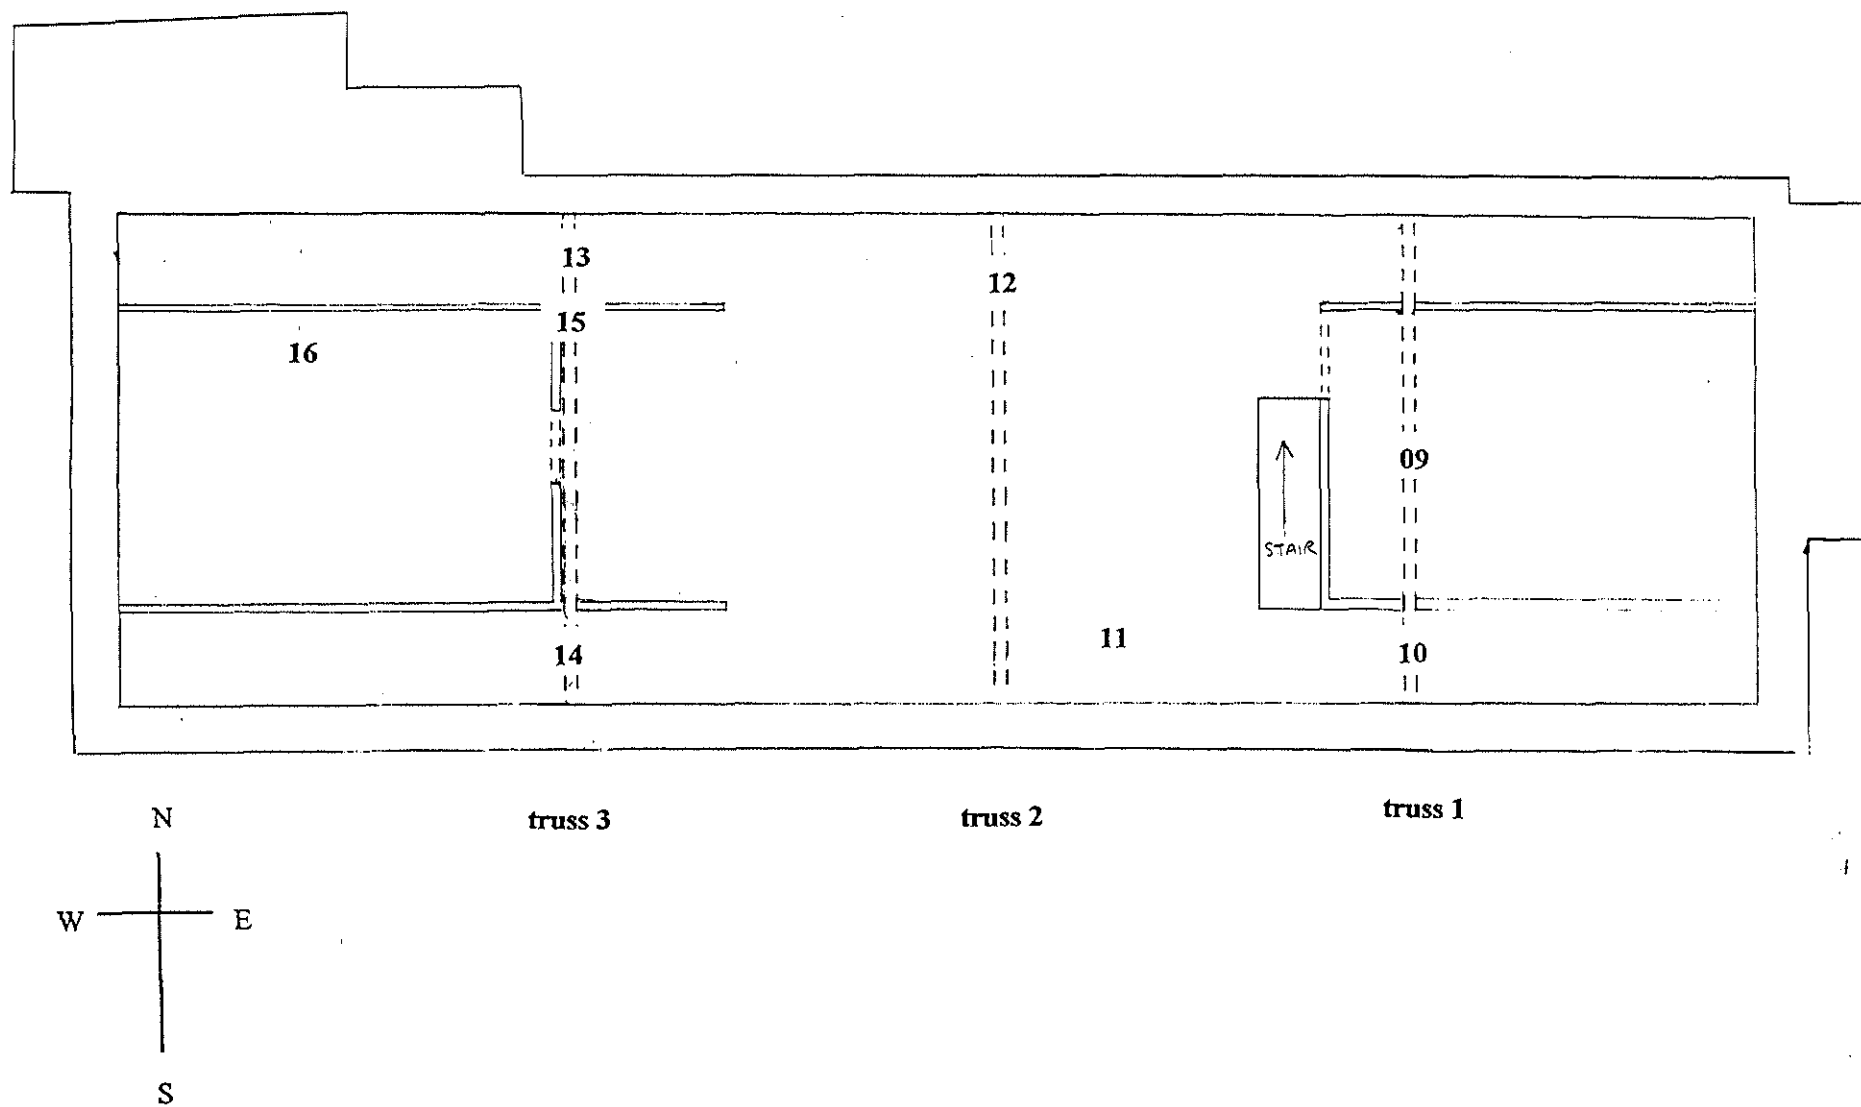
Plan of the ceiling timbers of the first floor of the farmhouse to show sample locations
